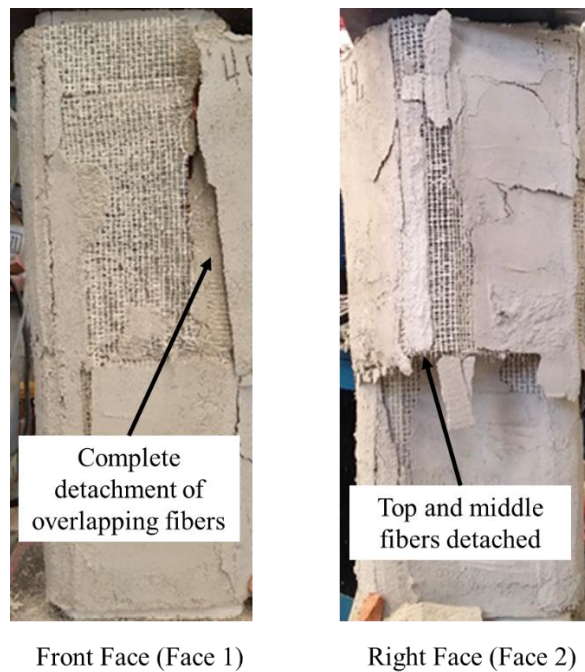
Specimen C-12-38-1-3 After Testing: Front and Right Faces
